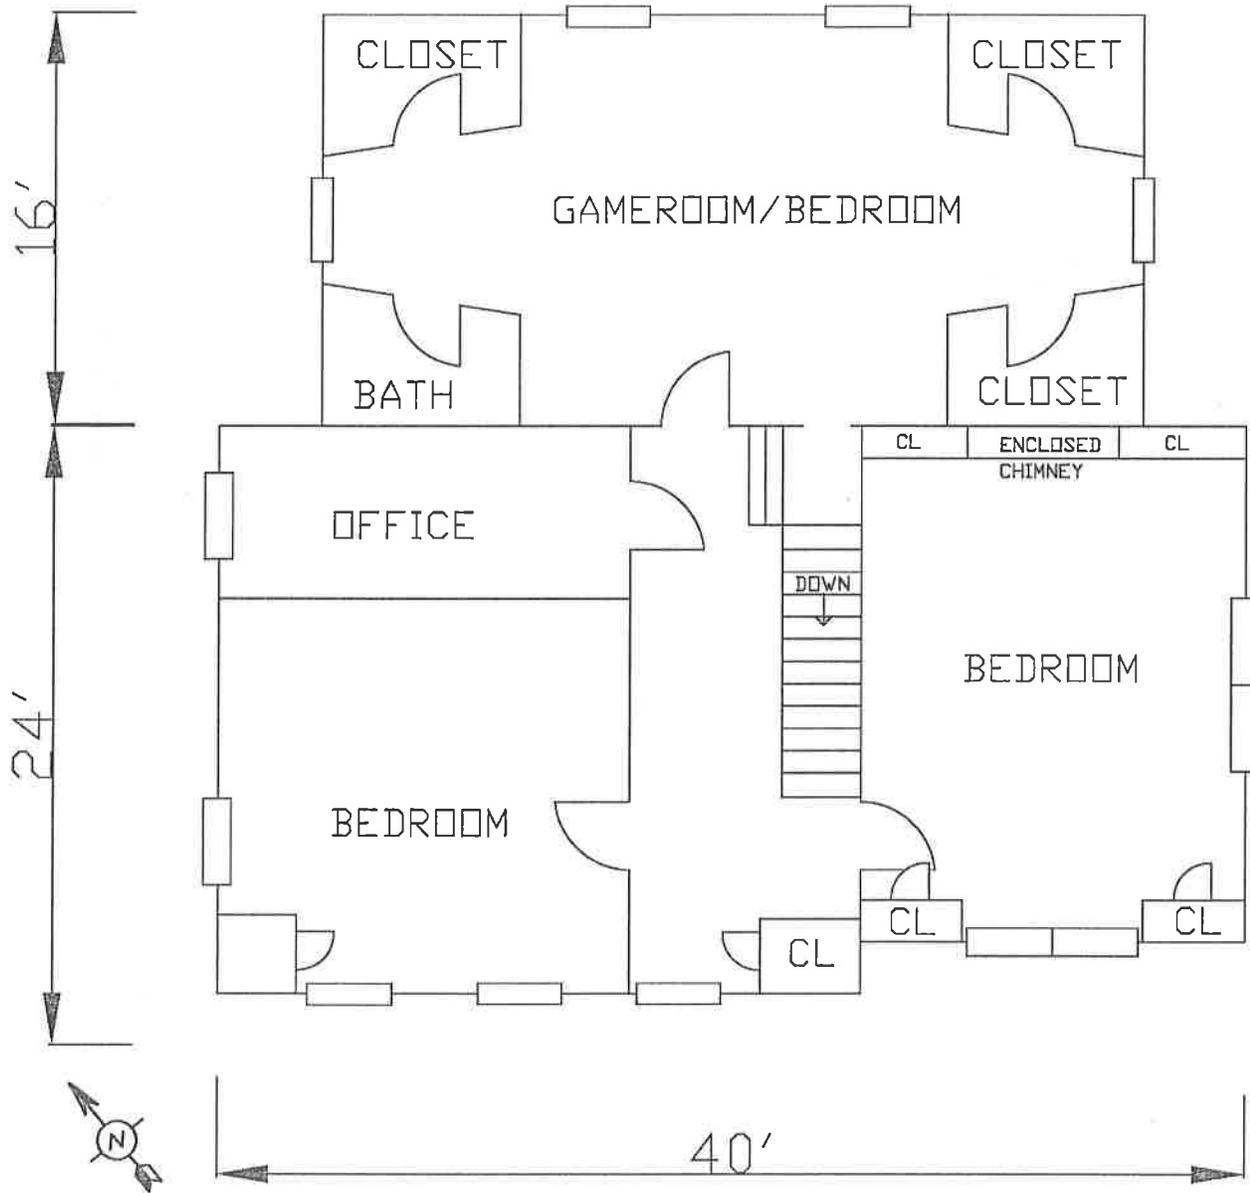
Second Floor Plan and Photographic Locations (Not to Scale)
